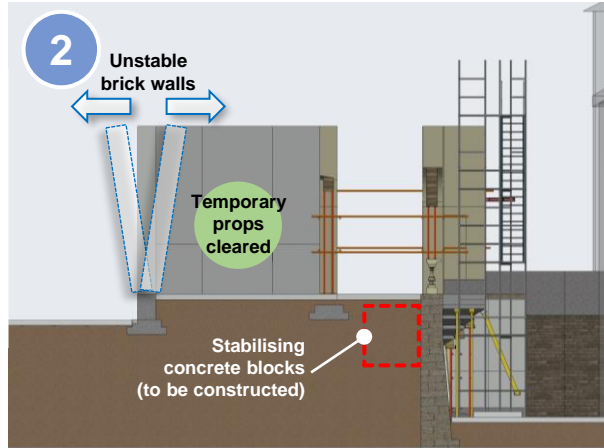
Approach for creating a safe construction environment for workers carrying out retaining wall strengthening work
